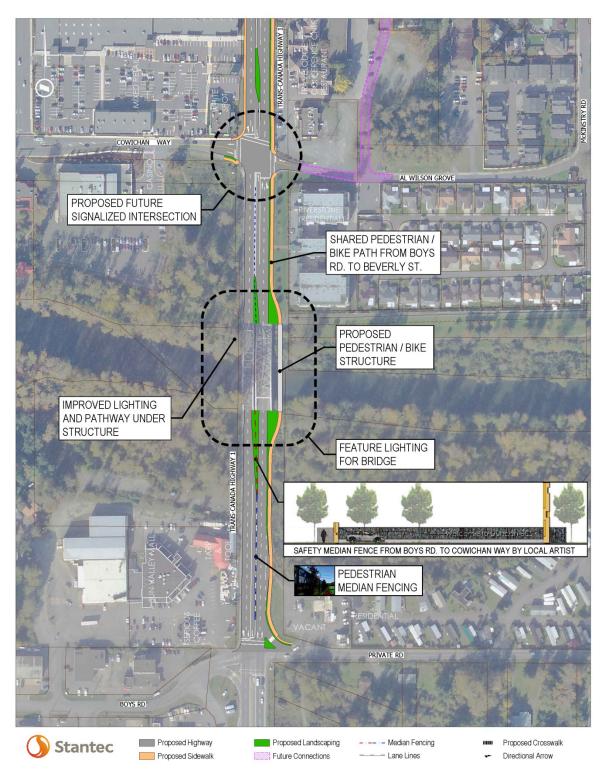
Long Term Transportation Plan–Boys Road to Cowichan Way
